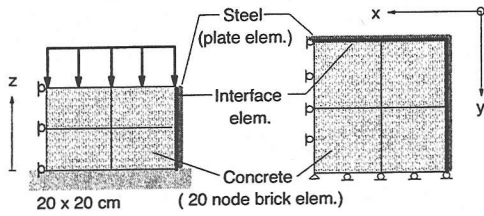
FE discretisation of steel plate confined concrete column (sectional analysis).
